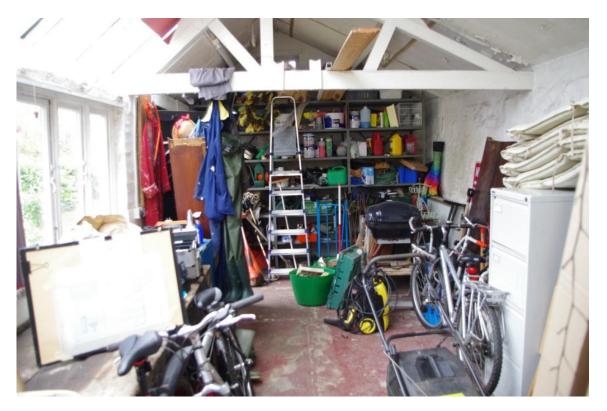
(1) Exposed Tie Beam in Westernmost Wall (Looking South West).
